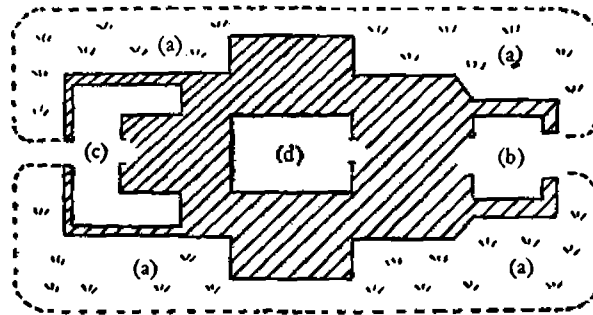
Floor plan of house : (a) Garden ; (b) Court ;
